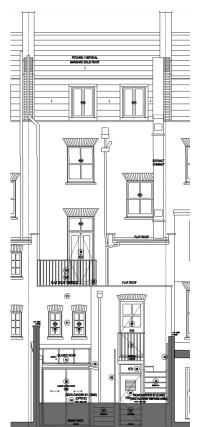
The approved rear elevation at 47 Marchmont Street (LBC).
